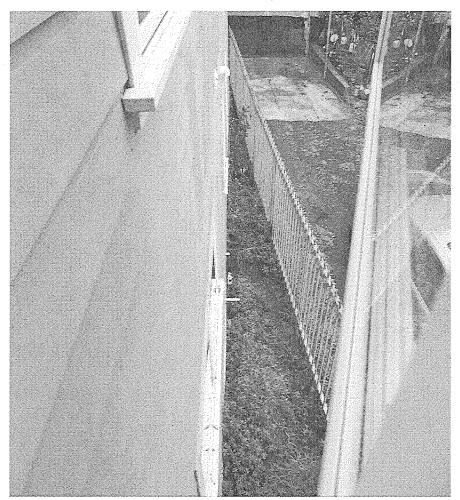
Inaccessible landscaped area adjacent to the north facade.
